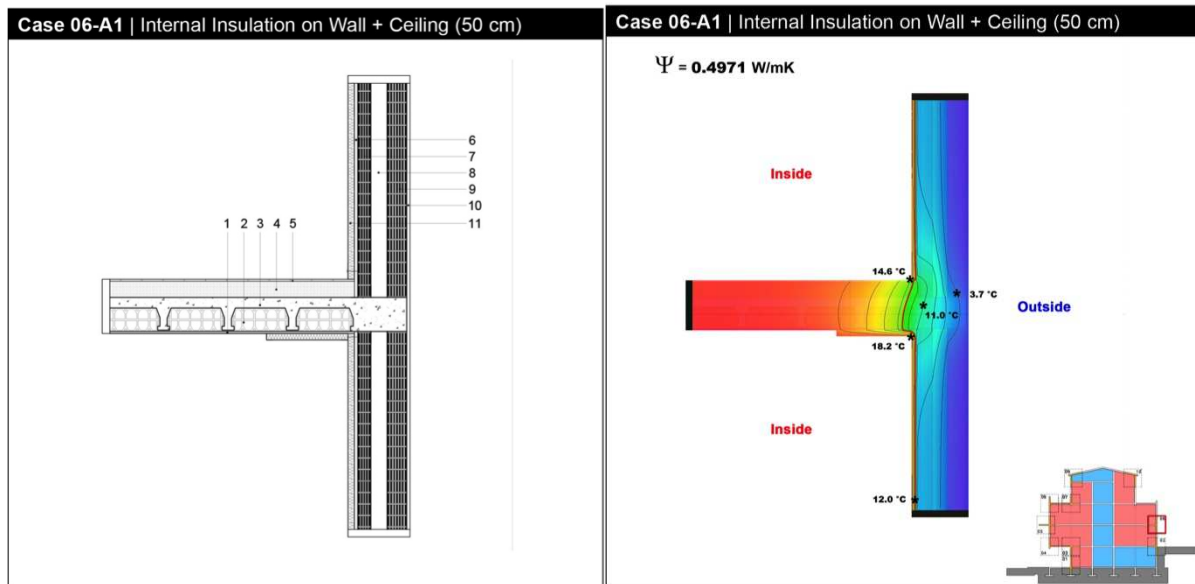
Technological detail and thermal bridge simulation of Case 06-A1 (Internal insulation and 50cm length on the ceiling of the horizontal slab).
